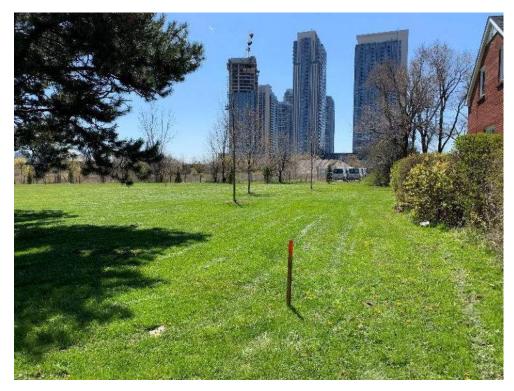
Location of BH 5 in Collingwood Park, looking south.
